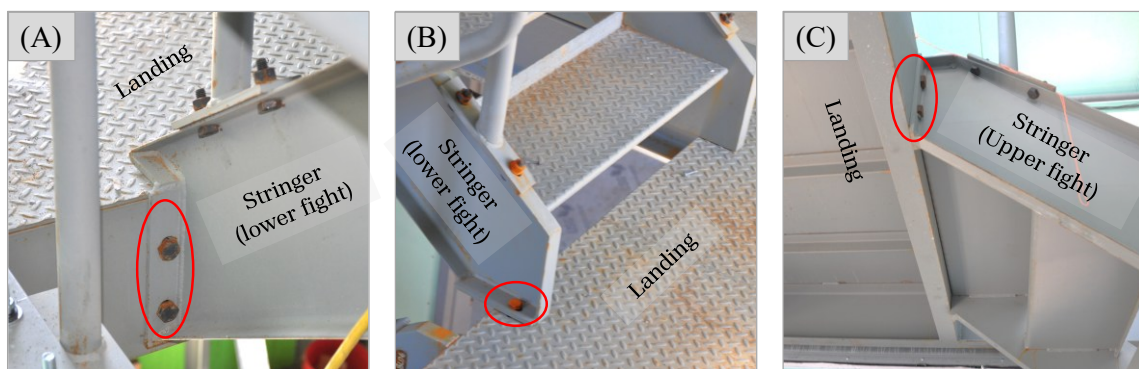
Stair flight to landing connections (A) fixed connection between the lower flight to bottom landing (B) fixed connection with construction tolerance between the lower flight and the bottom landing, and (C) fixed connection between the upper flight and the top landing.
